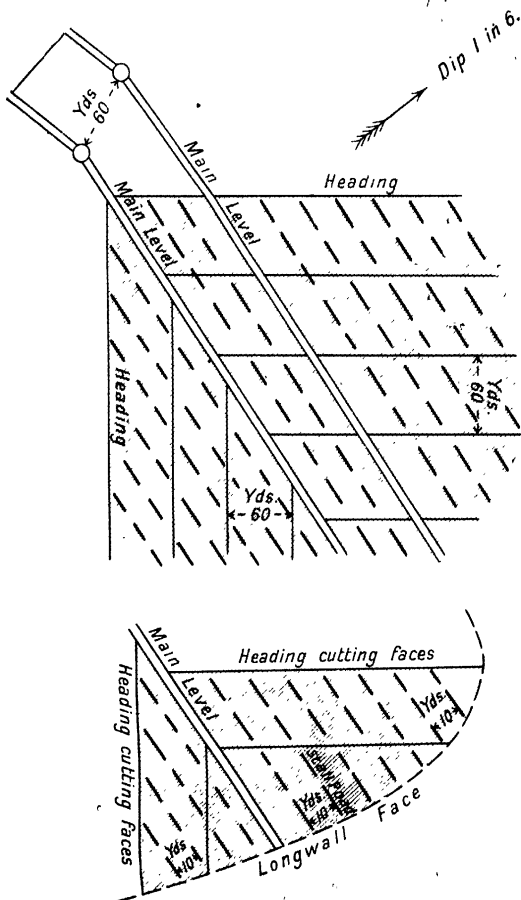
SKETCH SHOWING METHOD OF WORKING STEAM COAL SEAM.
